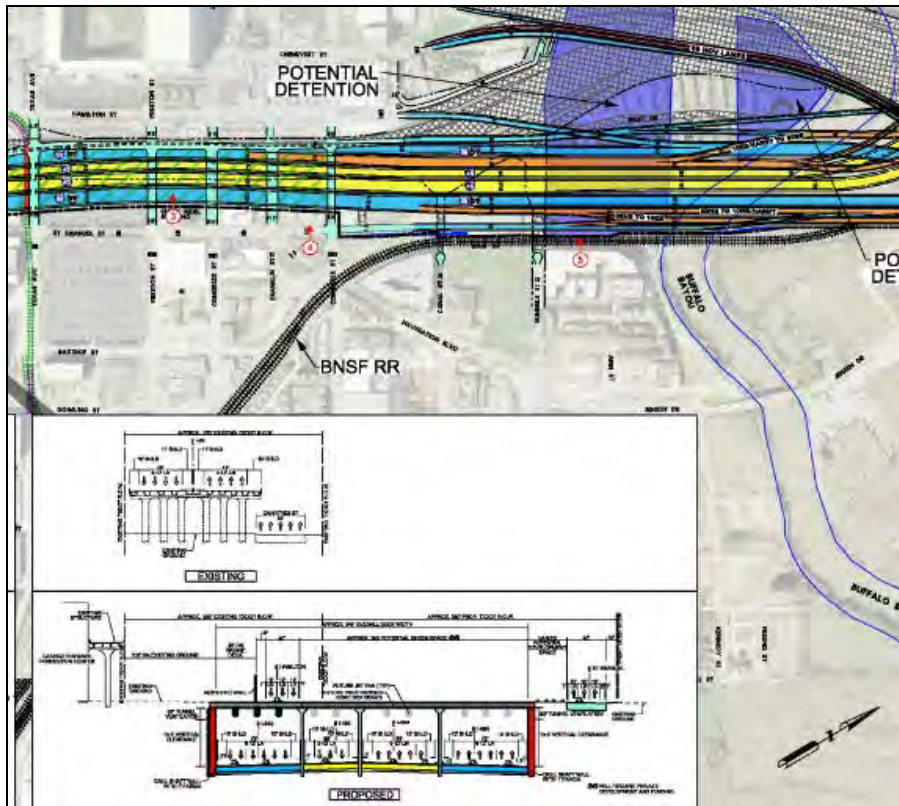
Preliminary design schematic exhibit showing Cheek Neal building in relation to the Proposed Action.
